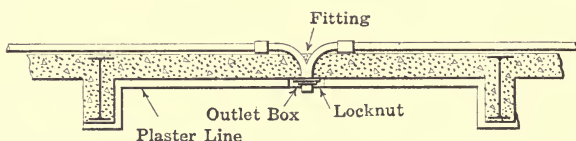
FITTING AND OUTLET BOX IN PLACE.
